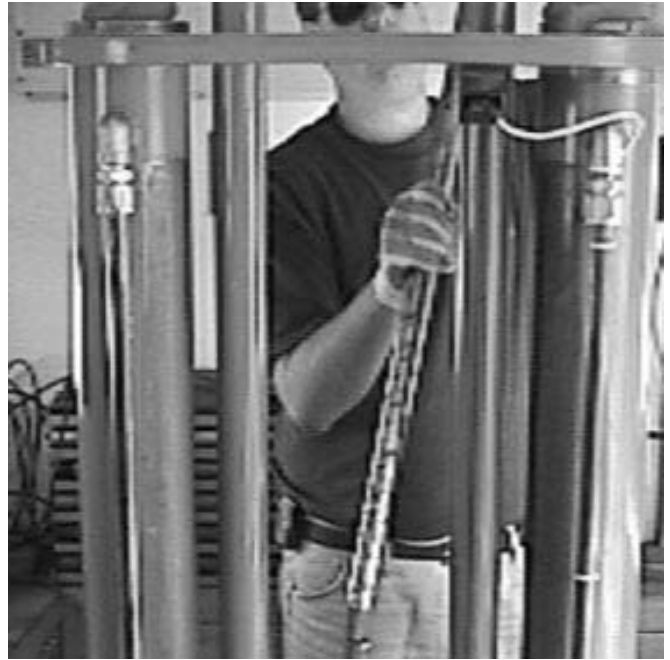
Insertion of TDR sensor cable in CPT rods after attaching special disposable tip
